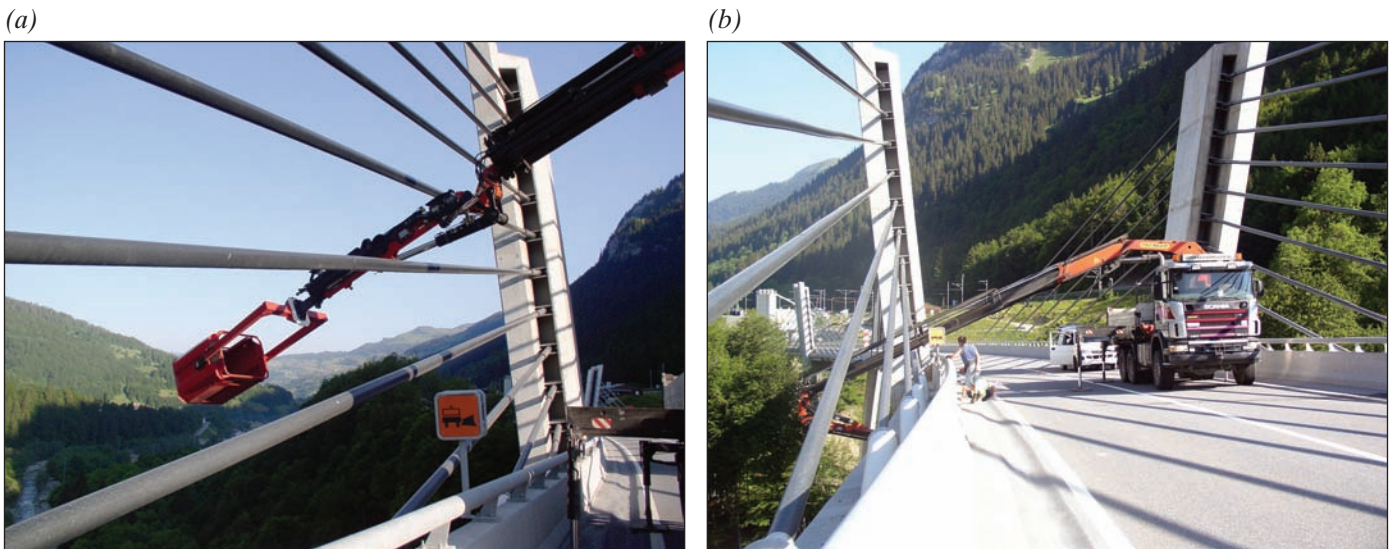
Access to bridge deck soffit by a lifting basket, (a) manoeuvring between the stays, (b) room needed for the traffic space
